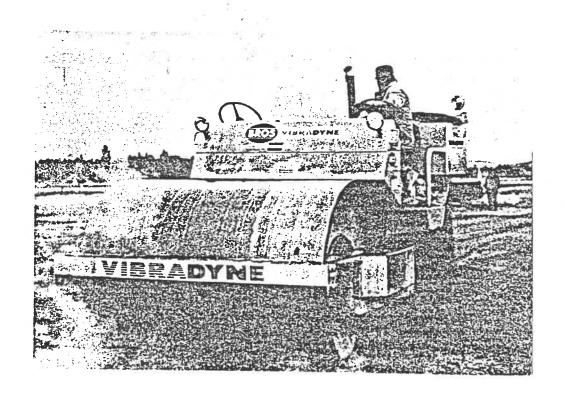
A. SINGLE DRUM VIBRATORY ROLLER
